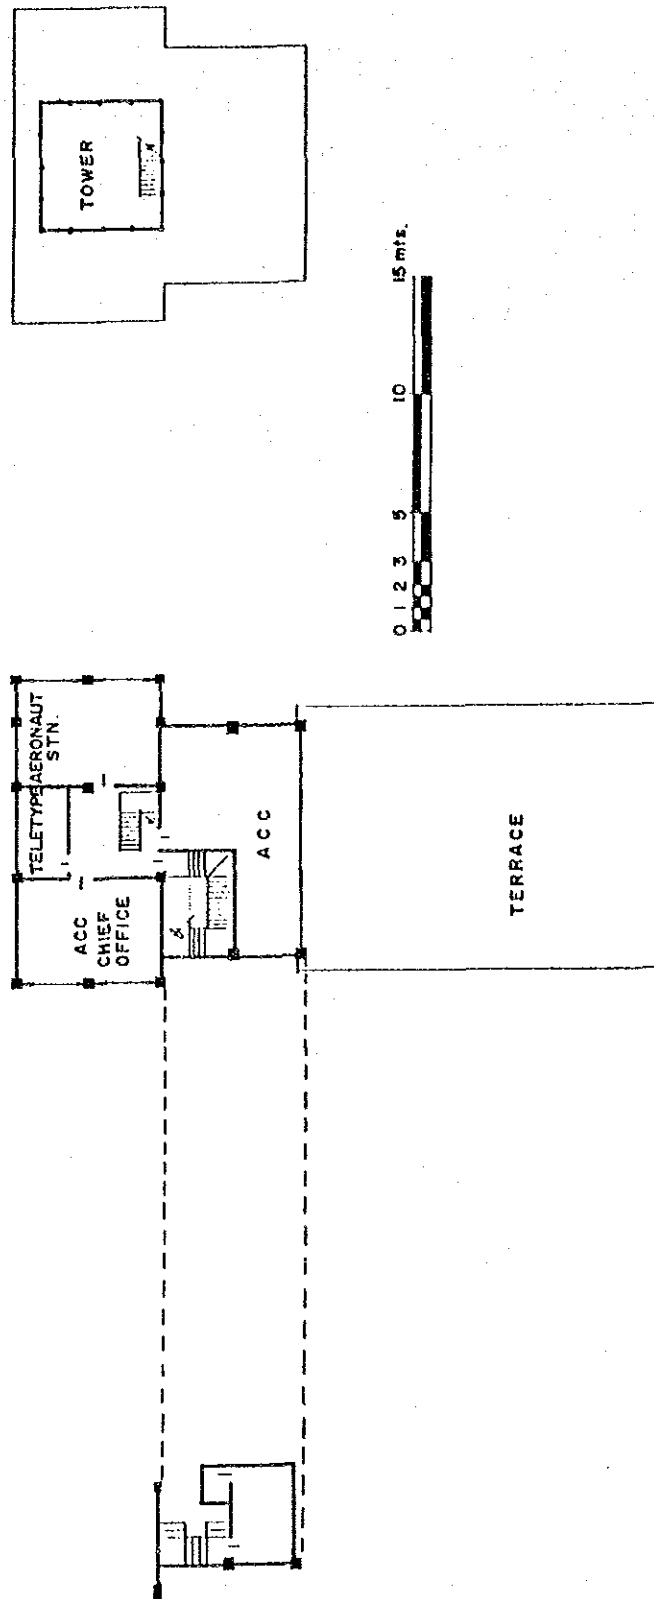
3rd Floor and Tower Plan of Existing Passenger Terminal Building
